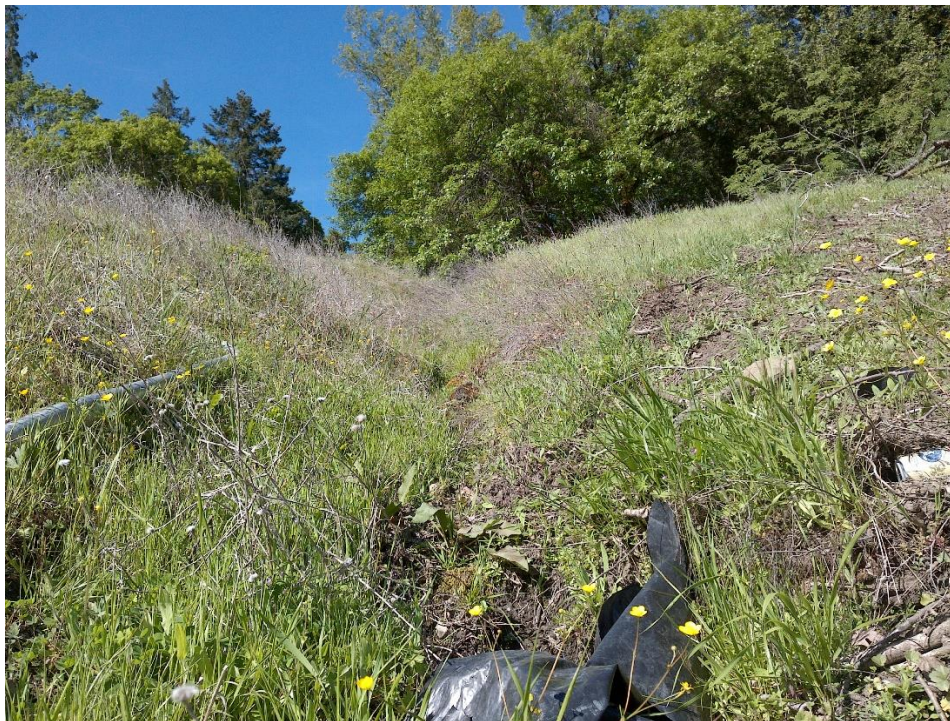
Looking upstream at outlet of culvert pictured in previous image at WQ3. The culvert outlet is perched 5 feet above the stream bed and has rusted through the bottom.
